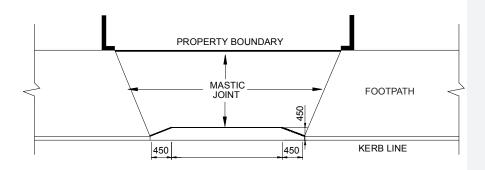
DETAIL - PEDESTRIAN RAMP FIGURE 4.17
